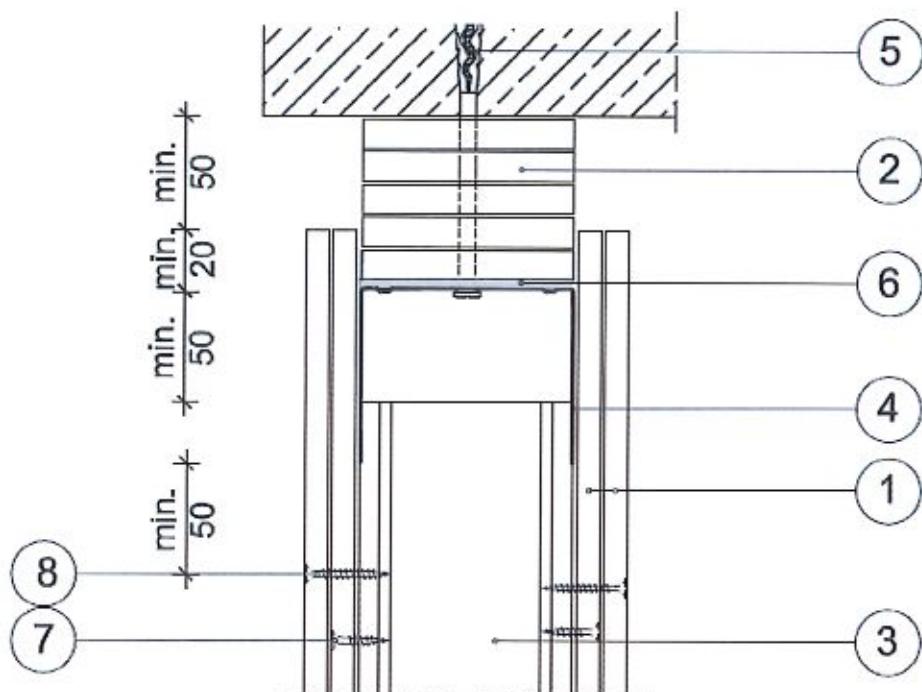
Vertical section. Telescopic connection of the wall, for the deflection of the ceiling up to 50 mm and the ceiling not propagating fire
